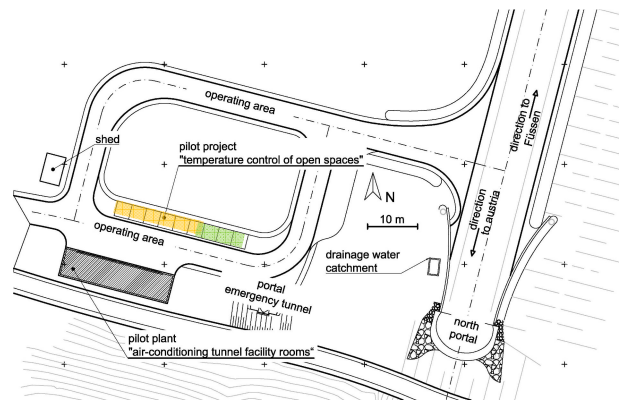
Plan view pilot plant „Air-conditioning tunnel facility rooms“ and pilot project „temperature control of open spaces“
